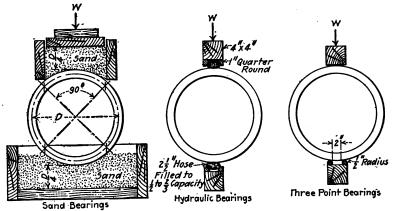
Bearings used in making tests of crushing strengths of tile.
